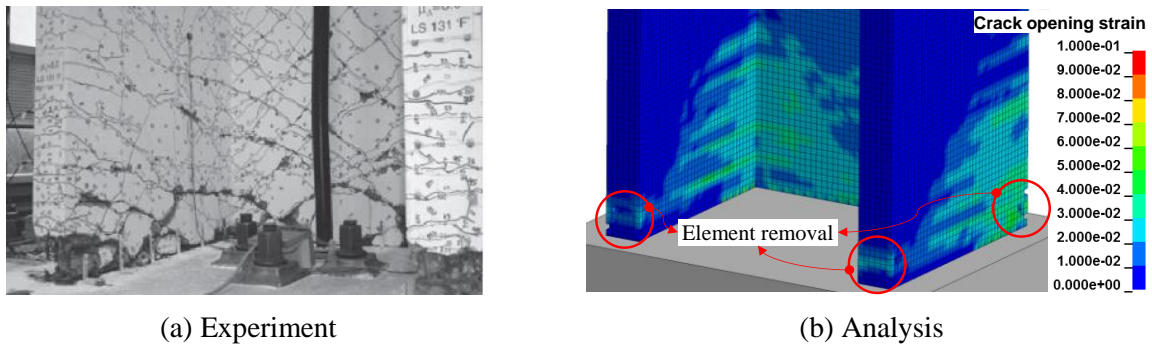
Damage at the base of the U-shaped wall tested by Beyer et al. (2008).
